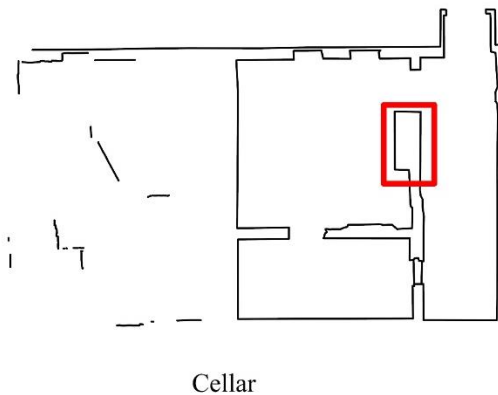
The location of the wall between Campaign Two and Campaign Four with the irregular brick bond. This wall treatment is not seen anywhere else in the cellar. This wall is part of the rebuilt chimney, dating back to Campaign Four's construction. Since pipes run through this wall, it may have been altered later.
